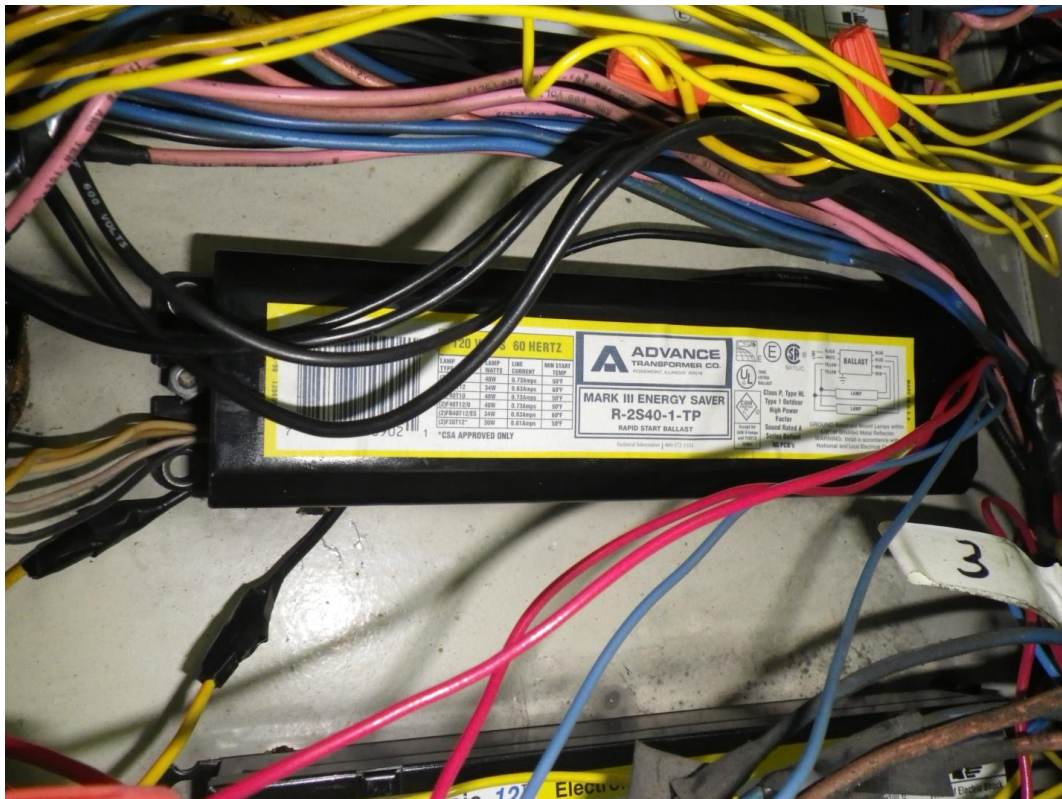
Detail of the ballast cabinet outside of Room 256. Only one old ballast was found in this cabinet (the others are newer electrical ballasts). The yellow staining is due to the CAPSUR decontamination solution.
